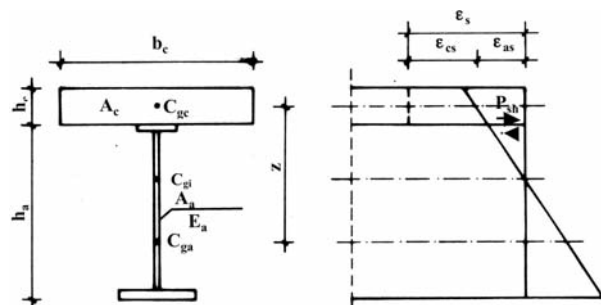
Dimensions, forces in cross-section and longitudinal layout
